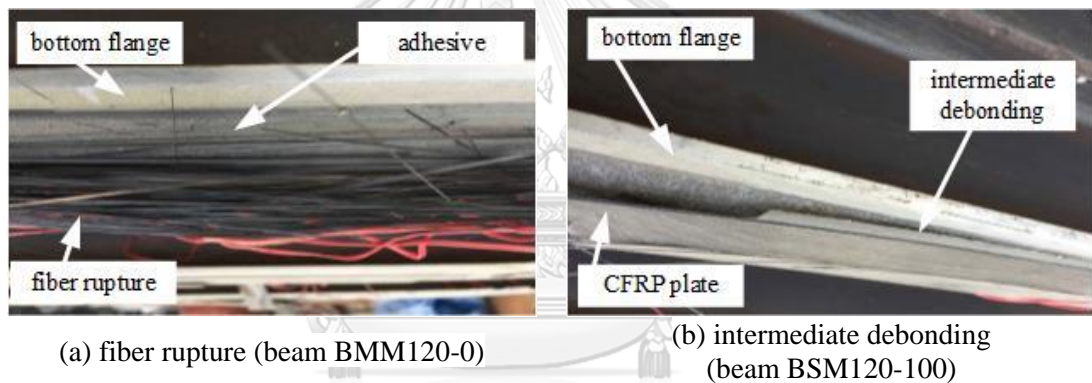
Typical failure modes of FRP-strengthened beams.
